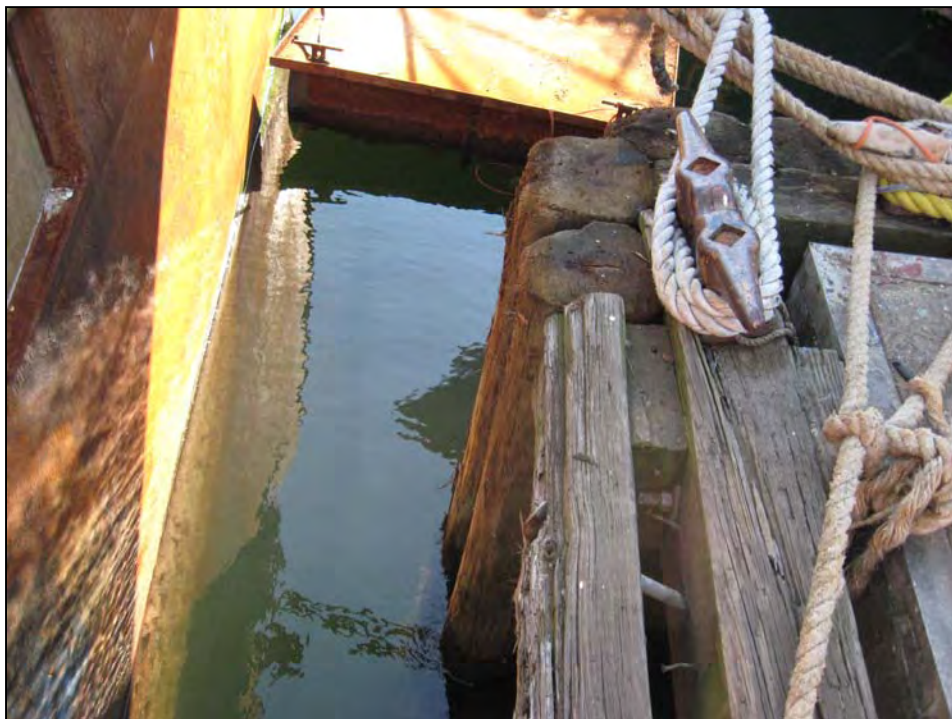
Worn fender piles and loose cleat at Station 8+80.
